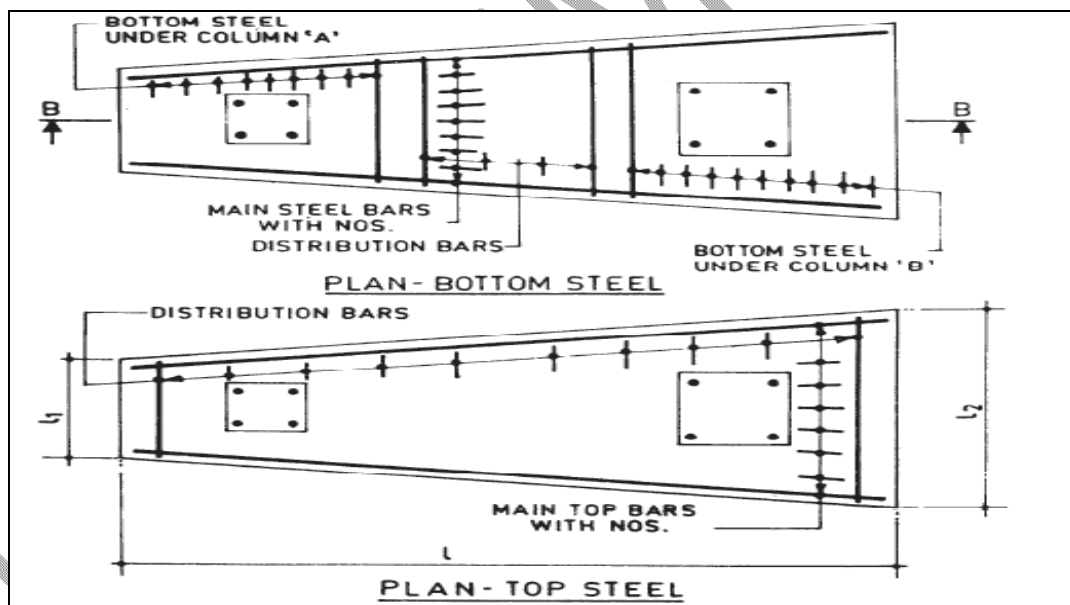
Typical detailing of a combined footing as described in SP 34
